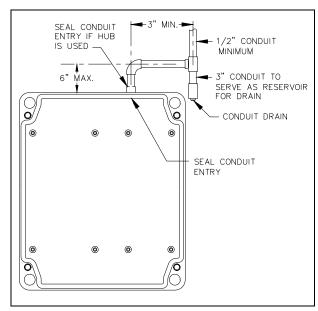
Top entry conduit installation for nonmetallic enclosures (NOT recommended)
